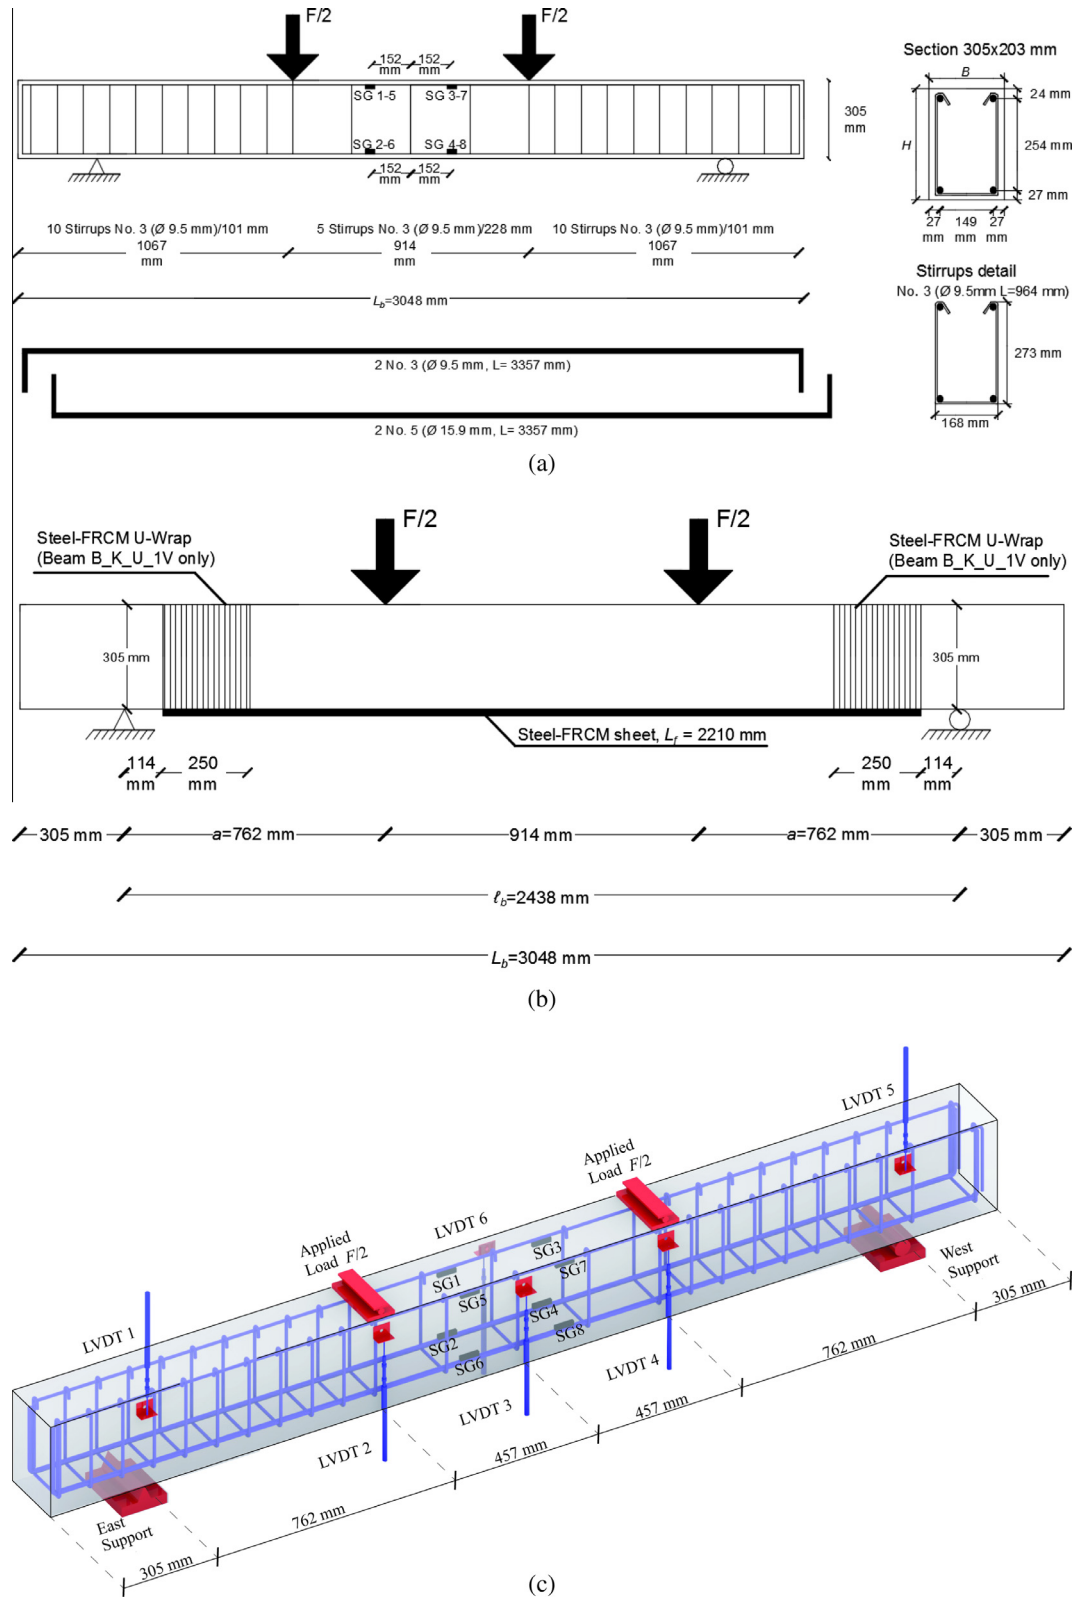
Beam geometry and reinforcement: (a) reinforcing steel layout, (b) steel-FRCM layout, and (c) instrumentation layout.
